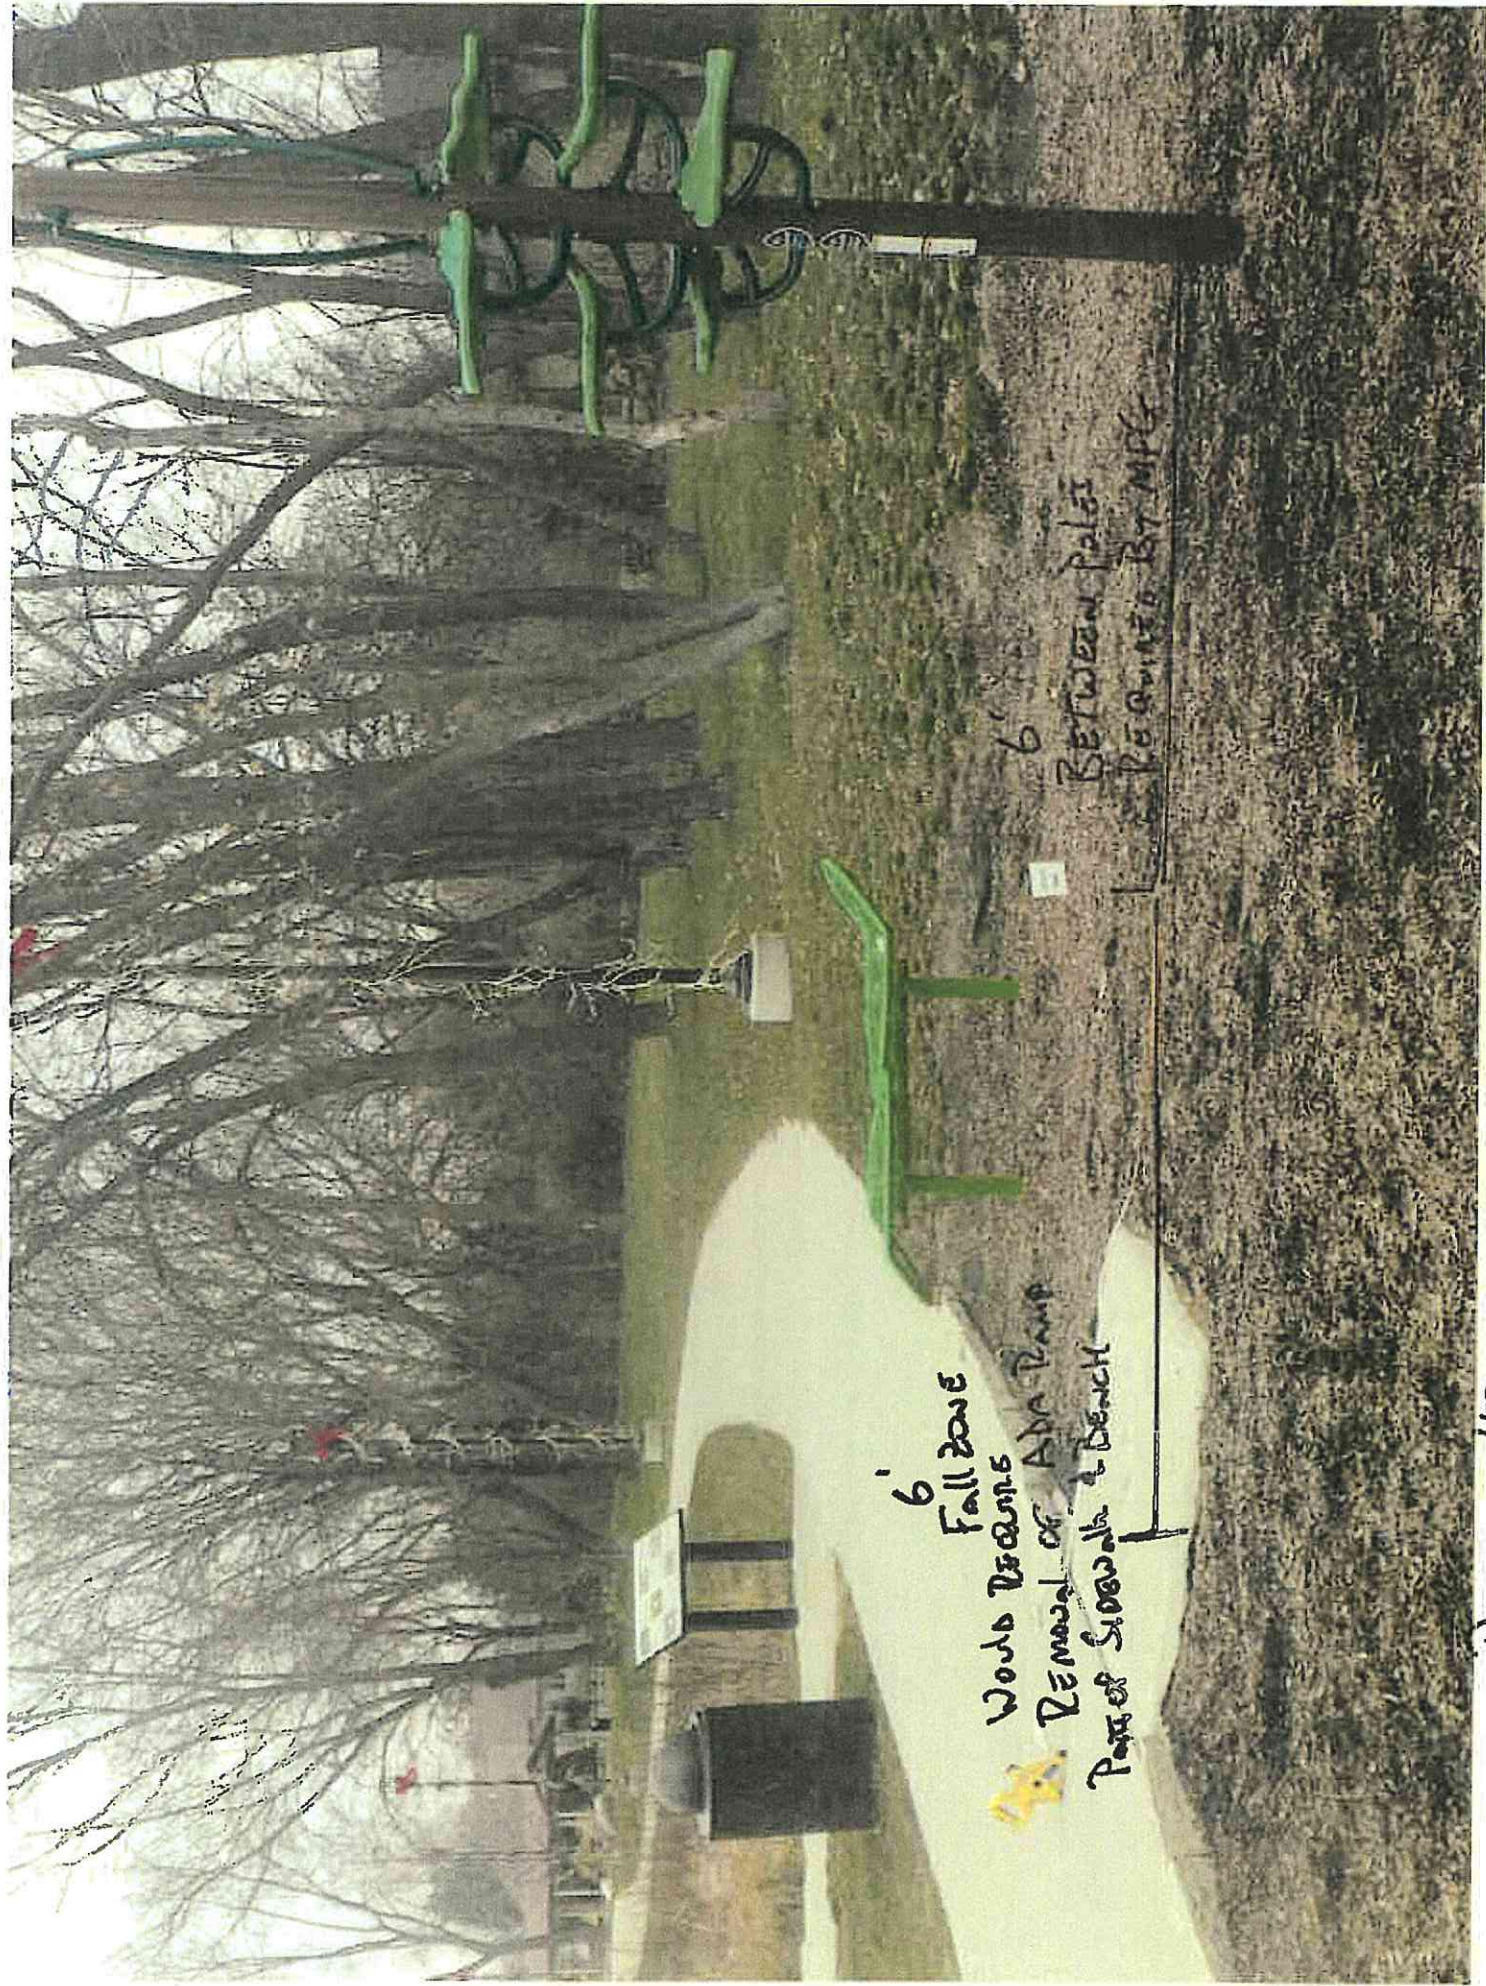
shows location of new climber and the area that would need to be excavated/graded to provide for ASTM required fall zone on the west side of current location. This would require removal of existing ADA ramp and removal and relocation of green bench and part of the concrete path.
